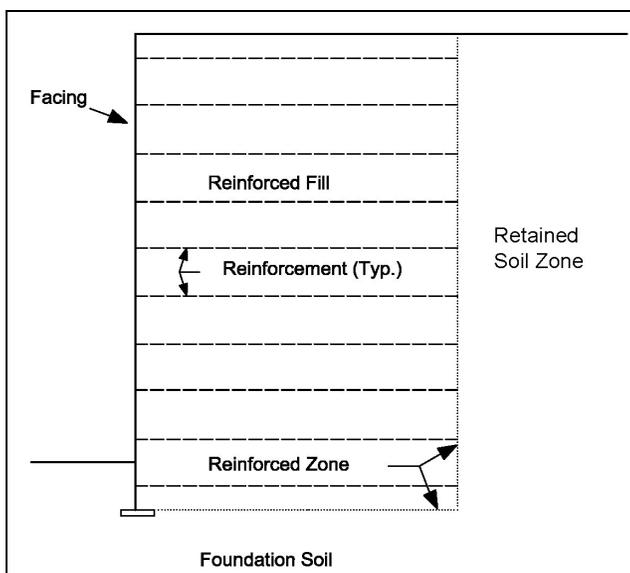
TYPICAL CROSS-SECTION OF A REINFORCED SOIL STRUCTURE
